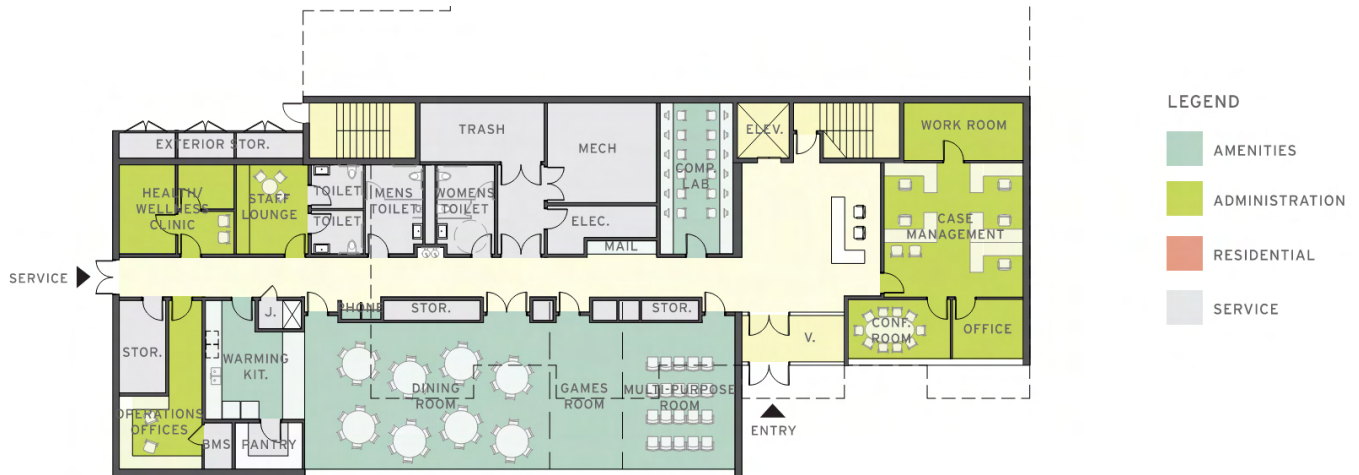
Initial ground floor plan; Source: CS-A Schematic Design Report
